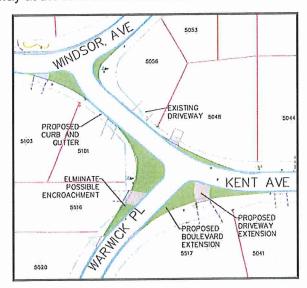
Proposed Geometric Configuration at Windsor Avenue/Kent Avenue Intersection and Kent Avenue/Warwick Place Intersection
